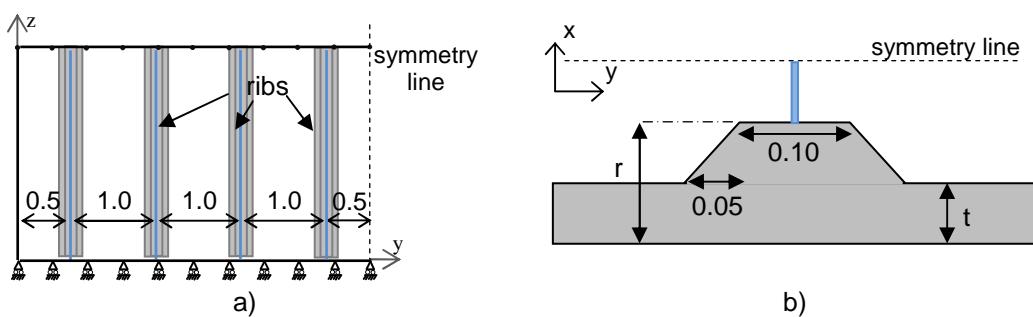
Sandwich panels comprising ribbed SFRSCC layers a) arrangement of ribs and connectors SFRSCC layers; b) detail of ribbed section (units in metres)
